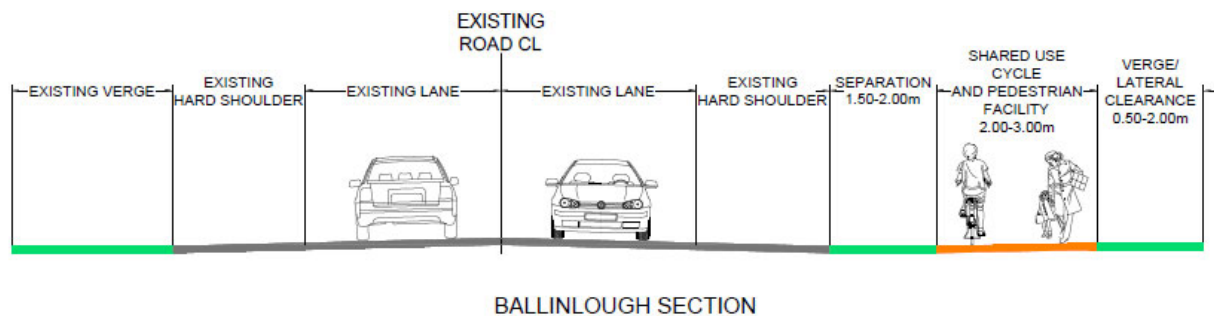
Typical Cross-Section of Existing N60 and Proposed Active Travel Scheme
